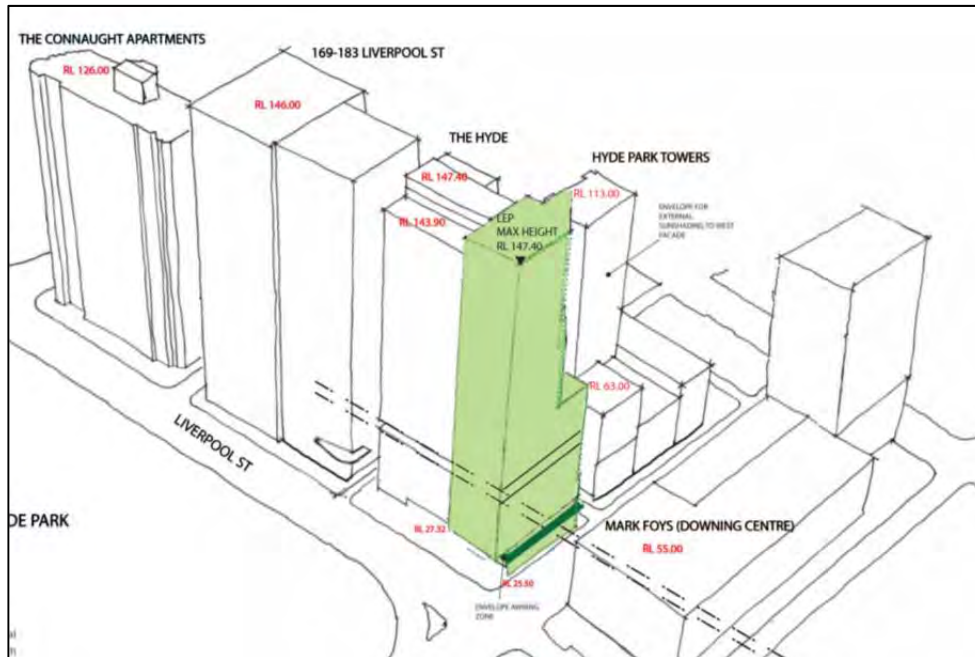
Aerial view of amended Stage 1 DA building envelope, which illustrates the chamfered edge on the southwestern corner
